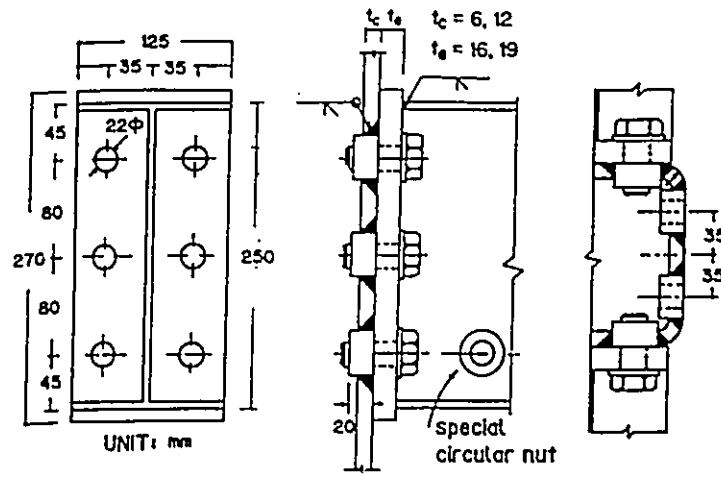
A moment connection with nuts welded on the column flange
